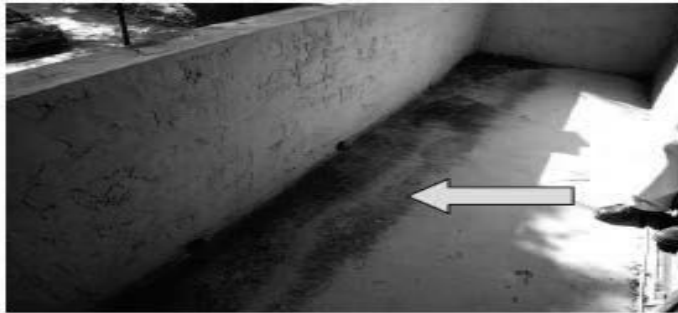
Unit 329: Typical balcony on the 1 bedroom / 1.5 bath unit.
